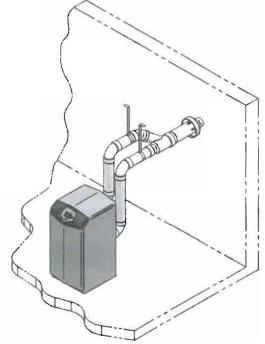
PVC/CPVC Concentric Sidewall Termination - See page 25 for more details
